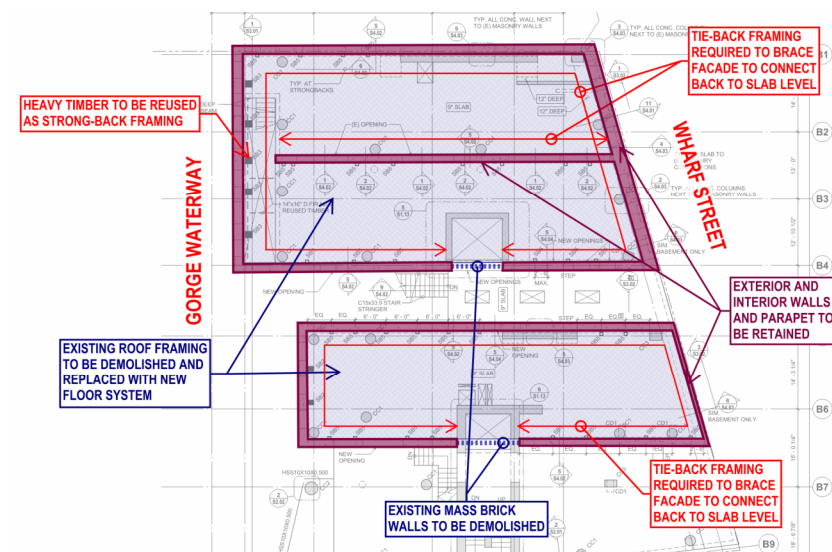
Roof Level Heritage Retention Plan (As Proposed by Developer)
